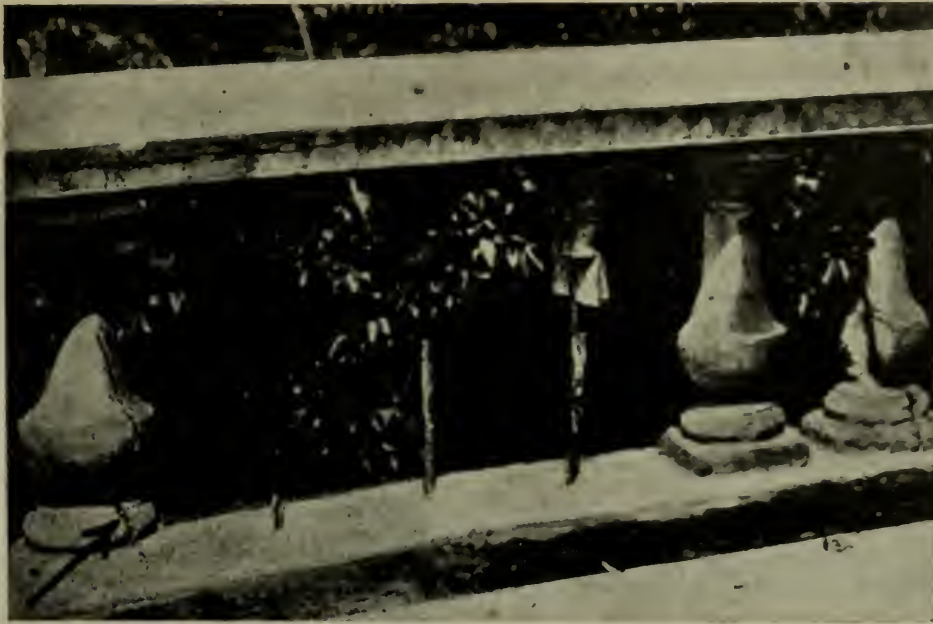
FAILURE OF CONCRETE RAILING NEAR NICE.
